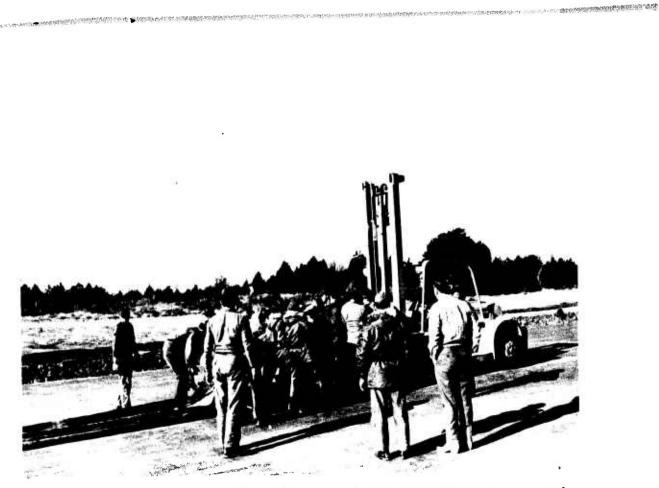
Troops accordion-folding membrane surfacing onto a wood pallet.
